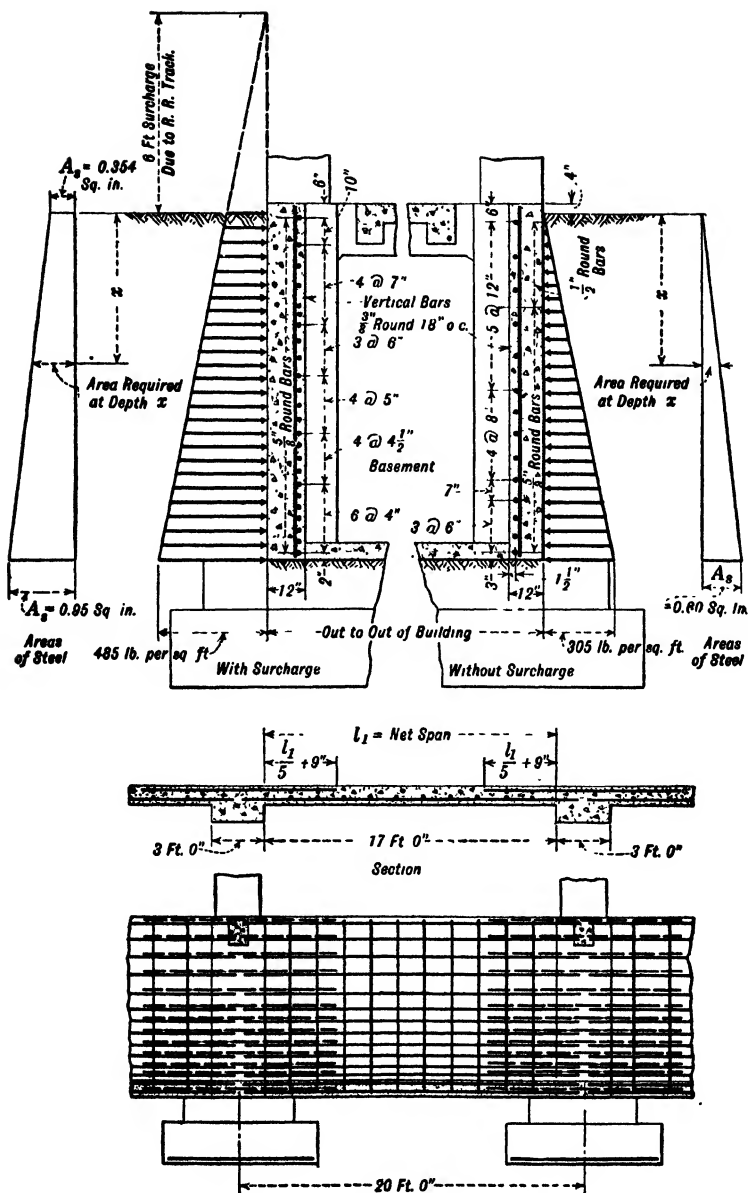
Detail of Basement Wall Supported at the Columns. (See p. 645.)
